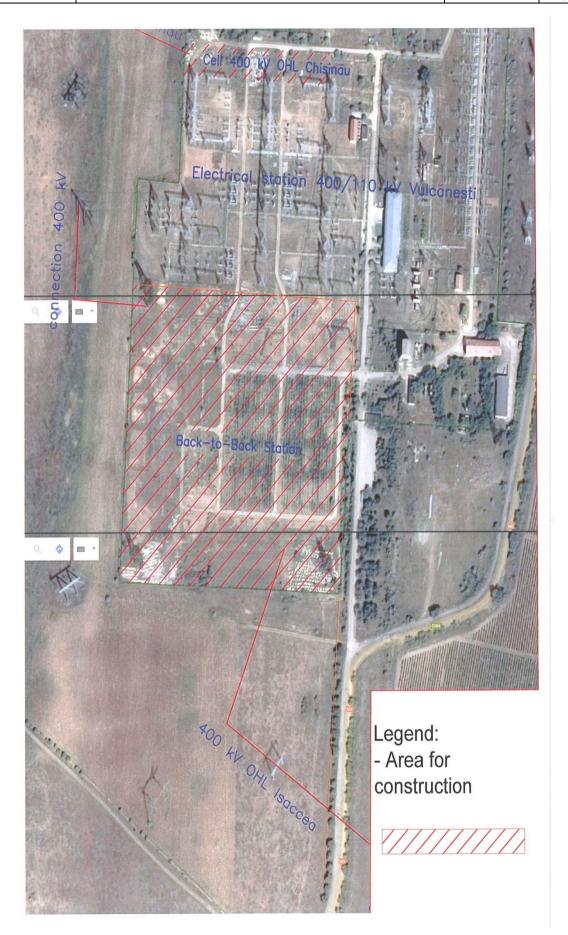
Vulcănești 400/110/35 kV sub-station and suggested area for construction of the "back to back" sub-station
